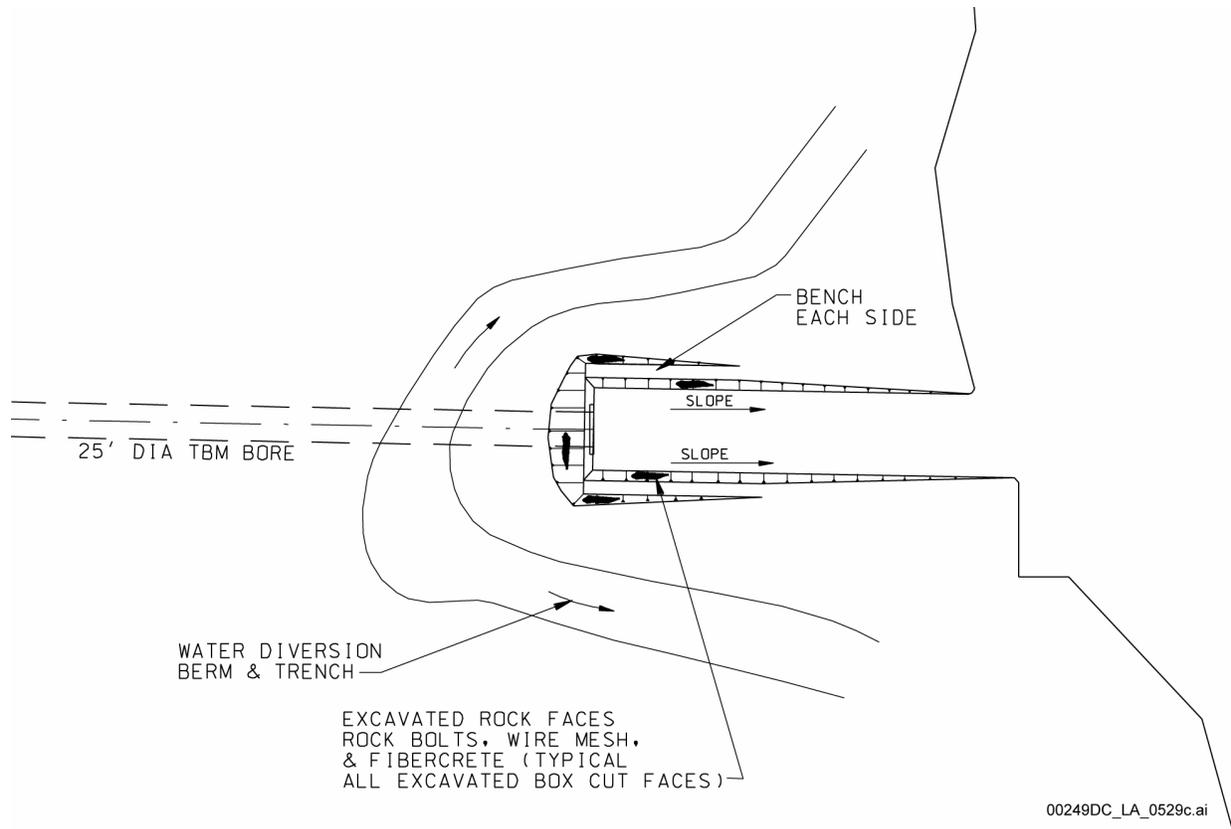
North Construction Portal Plan View (Typical)
